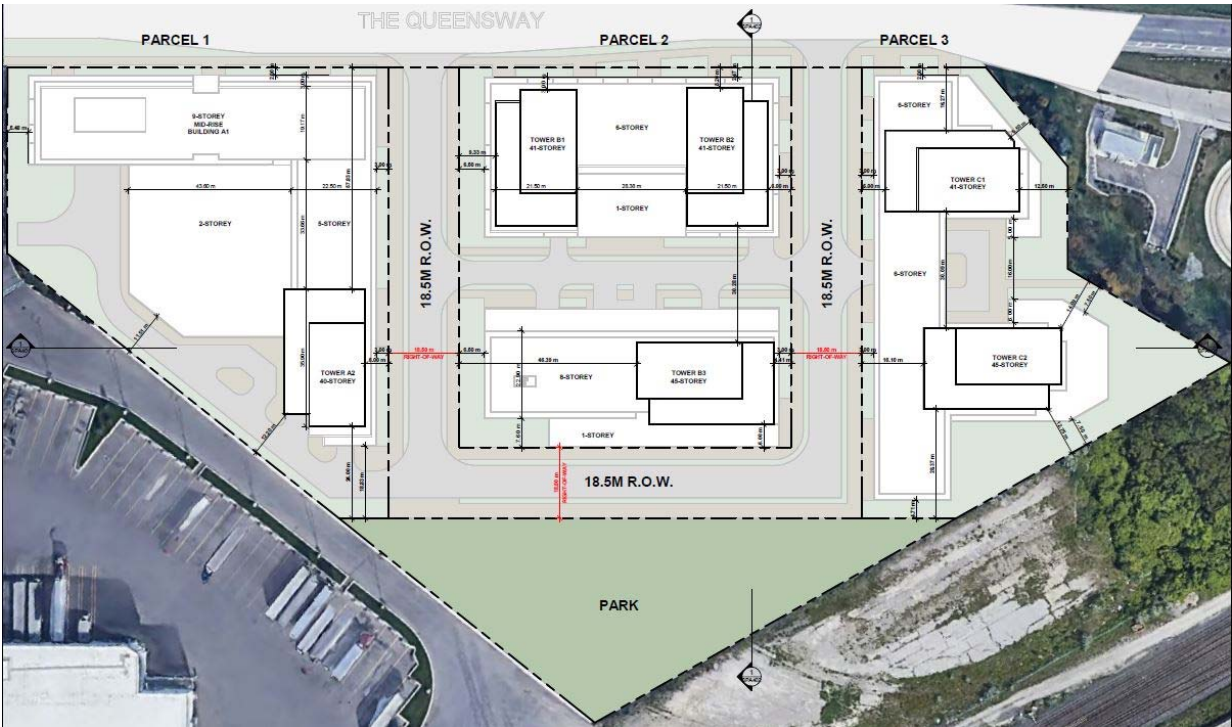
Conceptual Site Plan for Proposed High-Rise Mixed Use Development Site
